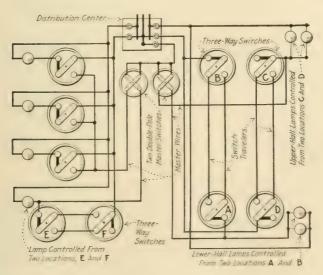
Straight master circuit for a three-wire, two-branch installation which contains single- and multi-location-controlled lamp groups.
